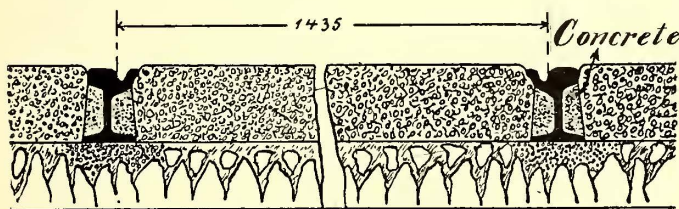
TRACK CONSTRUCTION IN MACADAM PAVING
